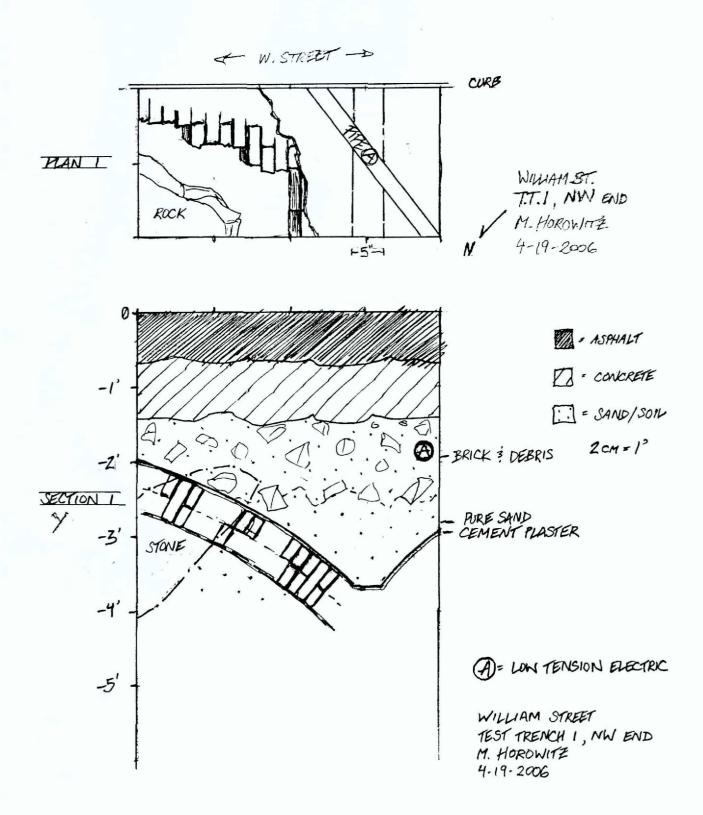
Plan and section of UTT / 1, northern end, looking south
